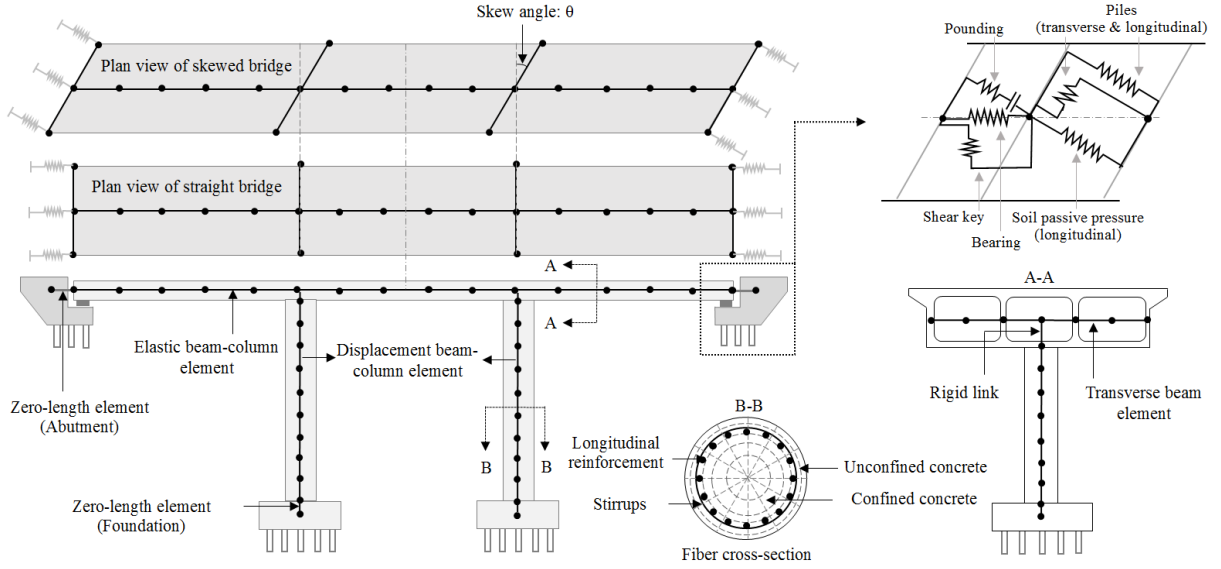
Typical layout of a single-frame, three-span, box-girder bridge
